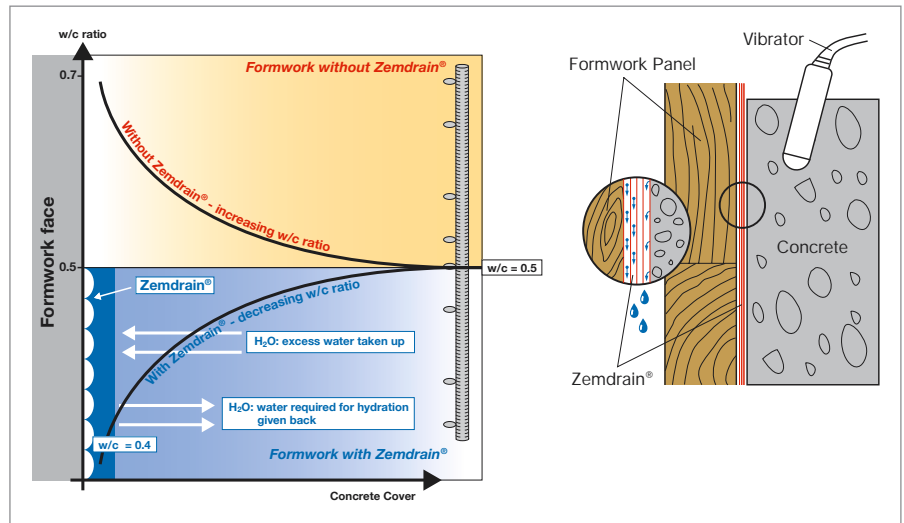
Drainage system of Zemdrain® formwork (CPF) liners for demanding boundary zones
